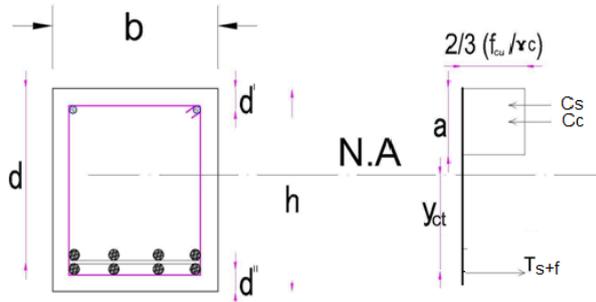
Acting Forces on the Cross Section Area of Tested Beam
